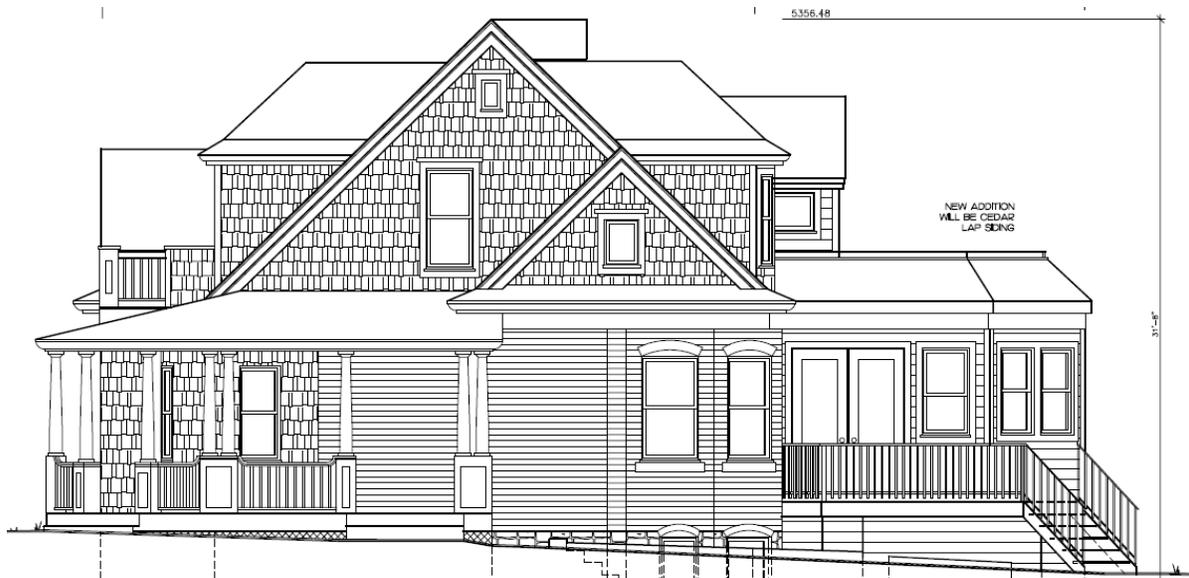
Proposed West Elevation, Landmark Alteration Certificate plans, 2014.
